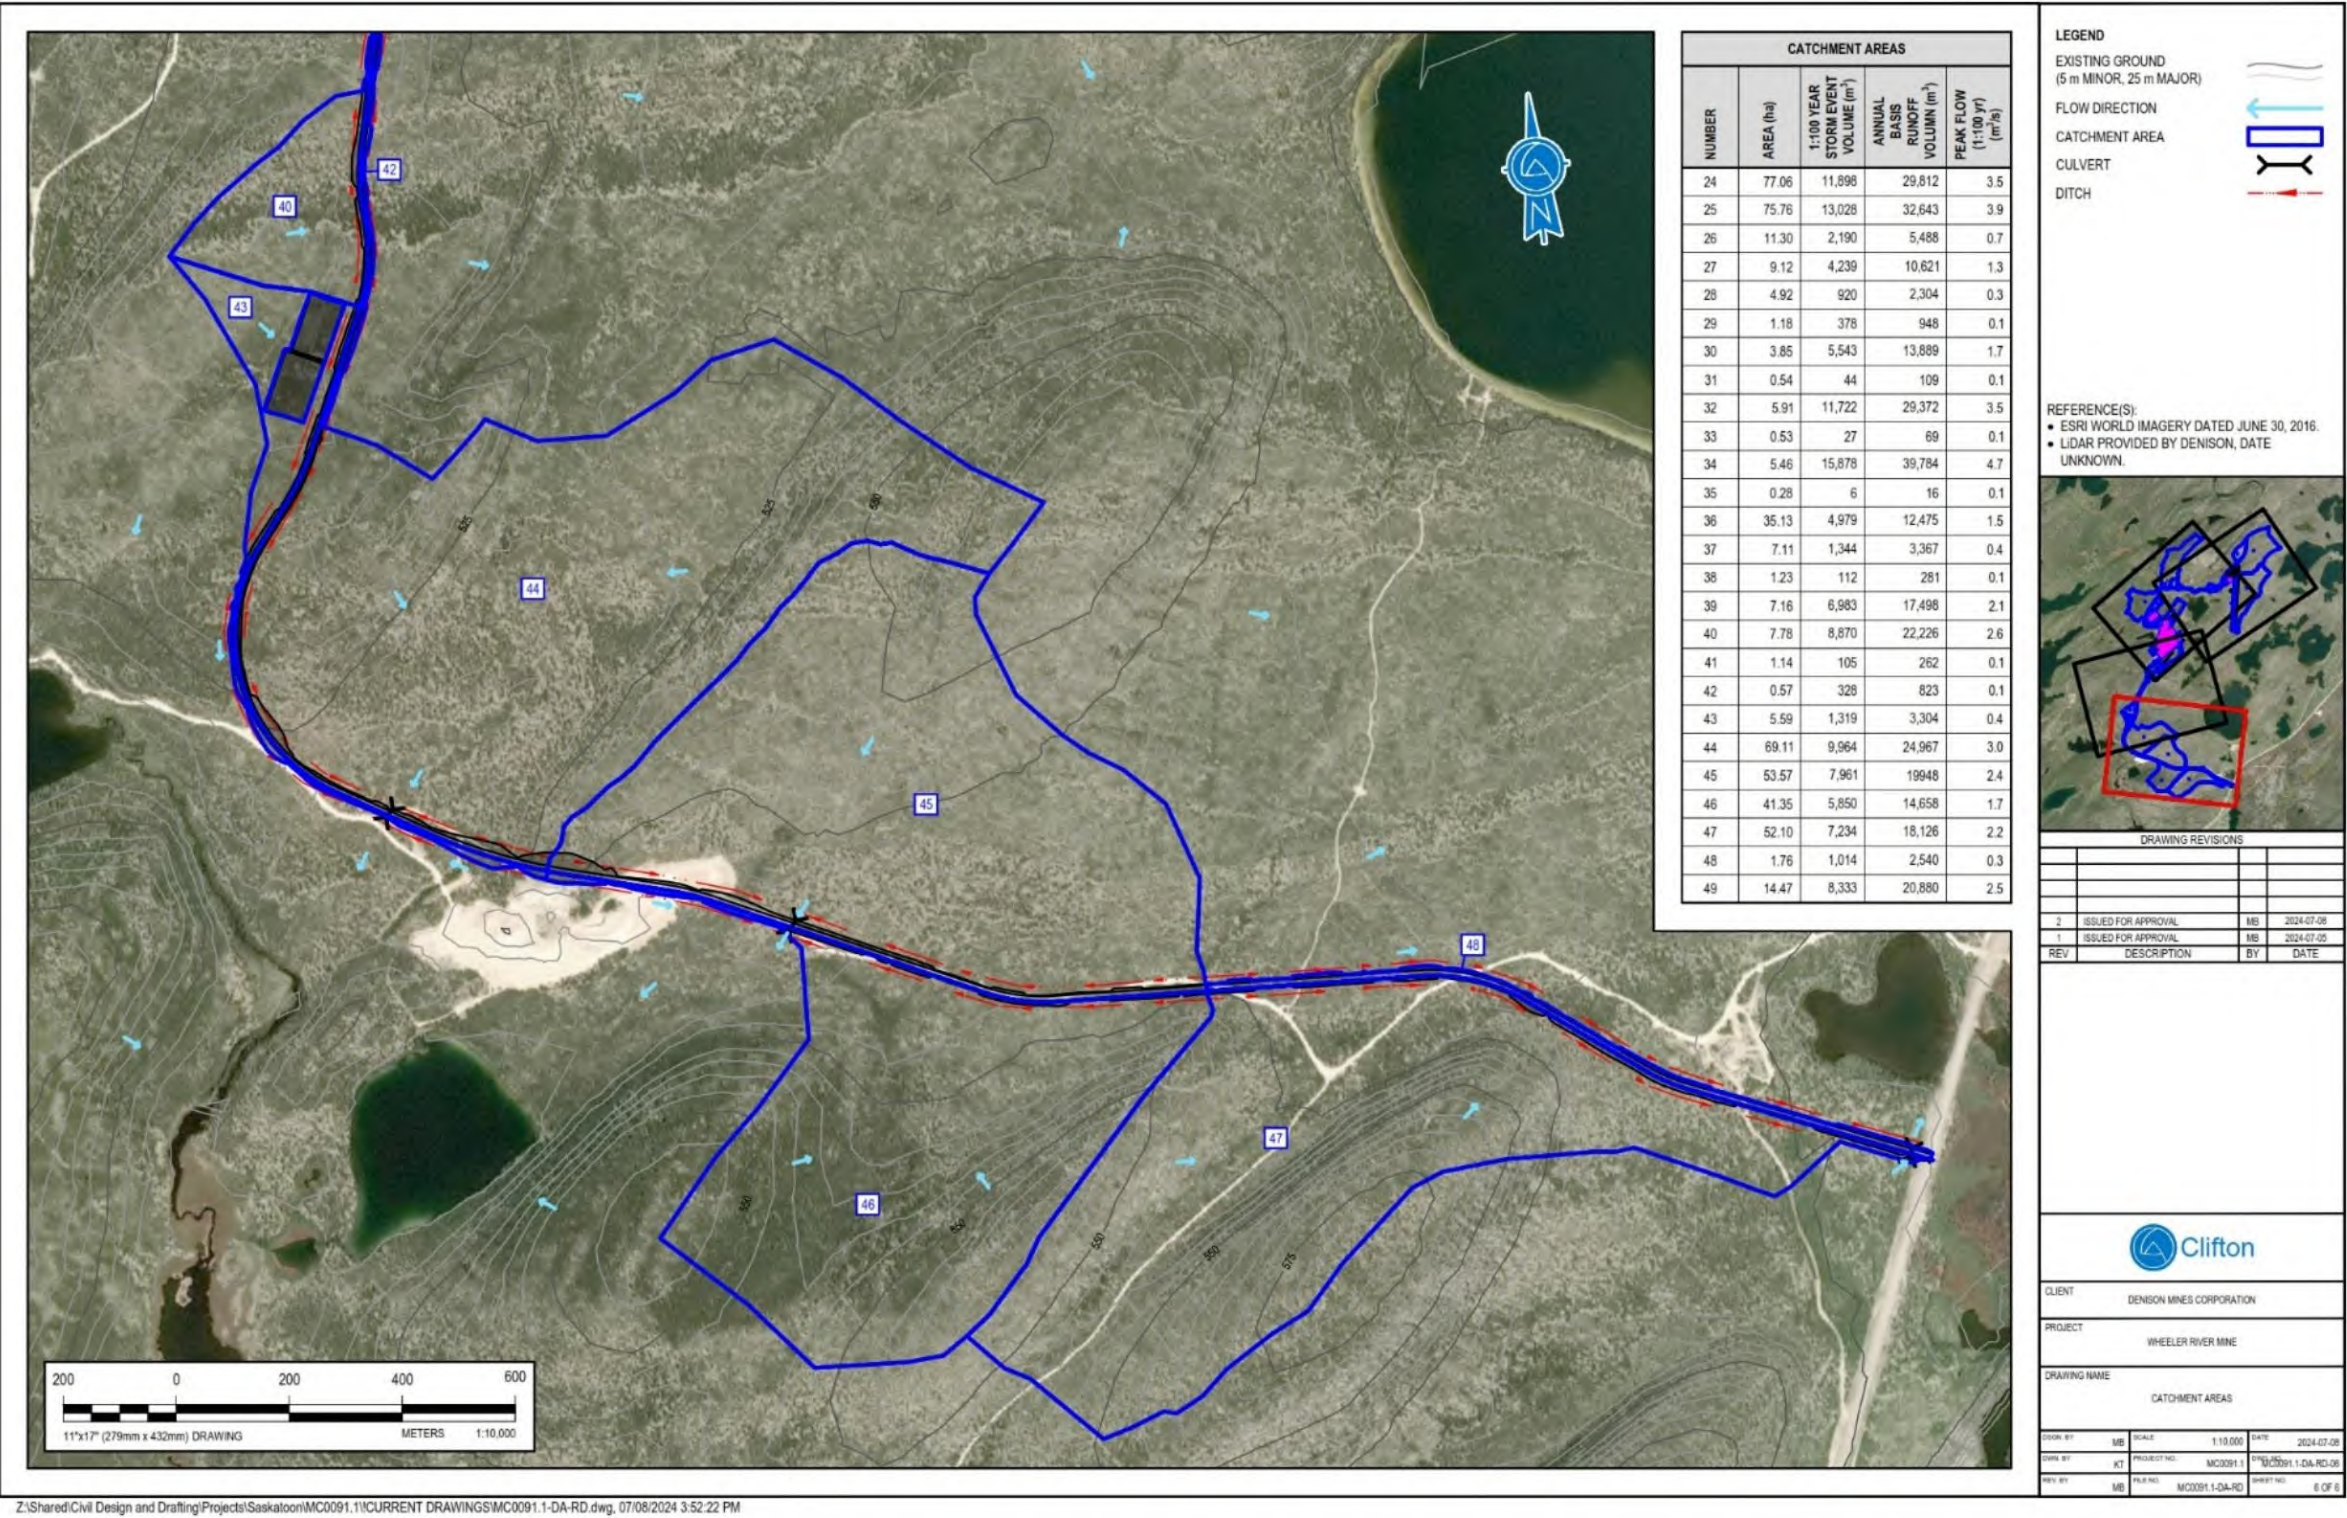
Site water management catchment areas – layout 5 of 5: Access road connection to Highway 914
